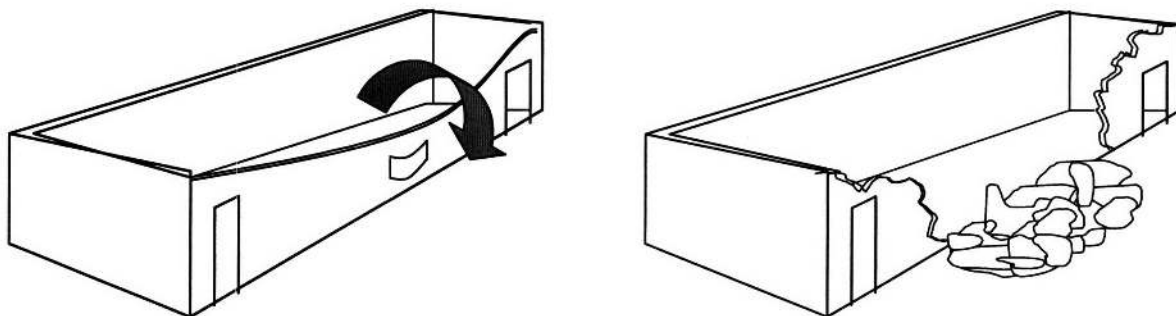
Out-of-plane failure of a long, continuous wall.
